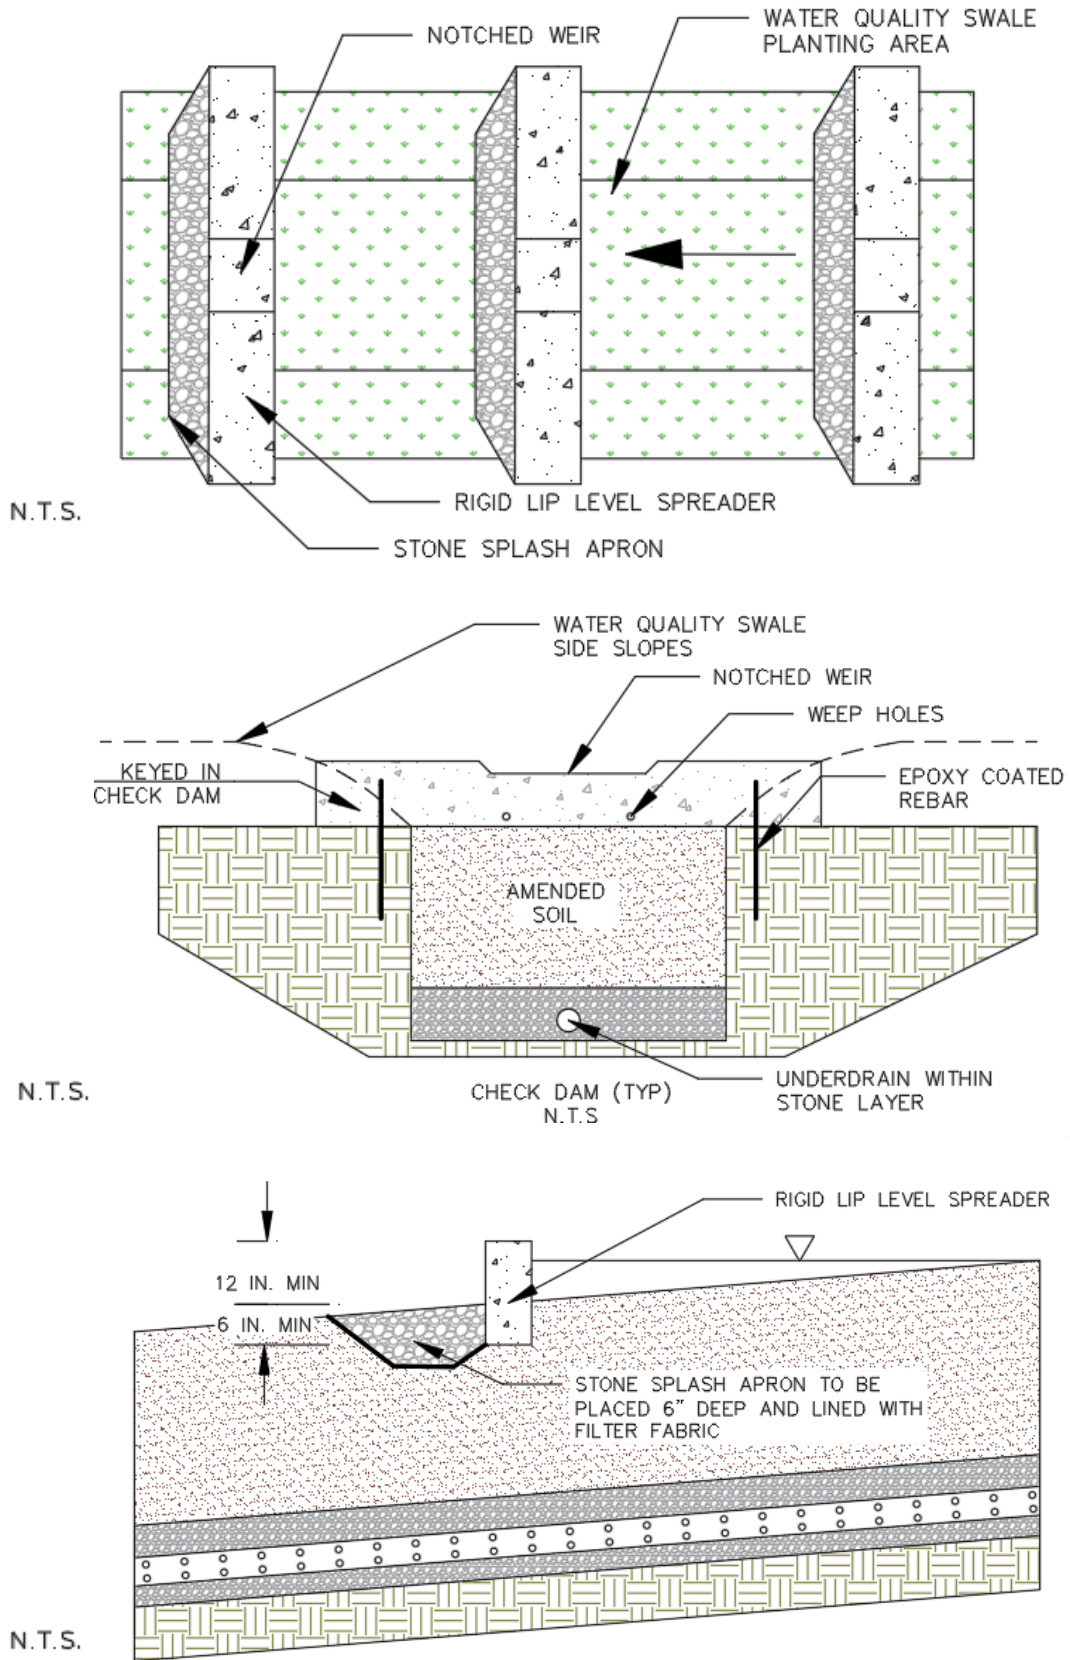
Typical Detail for Water Quality Swale Check Dam
